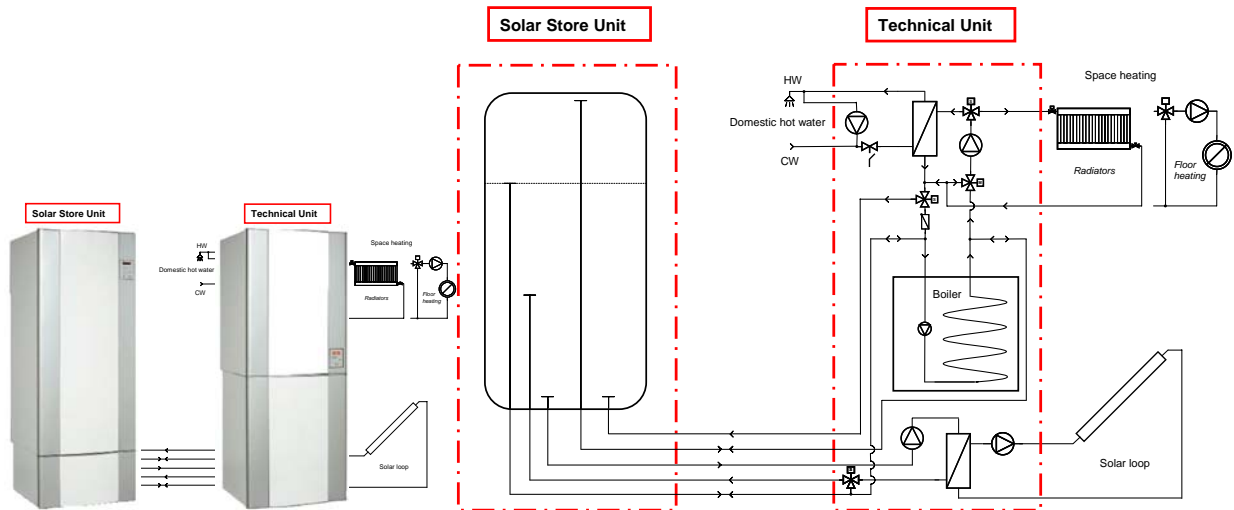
Right: Design of the compact solar combi system as two 60 x 60 cm units: On the left side a solar tank and on the right side the prefabricated technical unit with integrated condensing natural gas boiler or pellet boiler and all the other components like pumps, switching valves, mixing valves, expansion vessels, plate heat exchanger, controller, etc. Right: Hydraulic scheme of the REBUS solar combi system. Figures from /1/.
